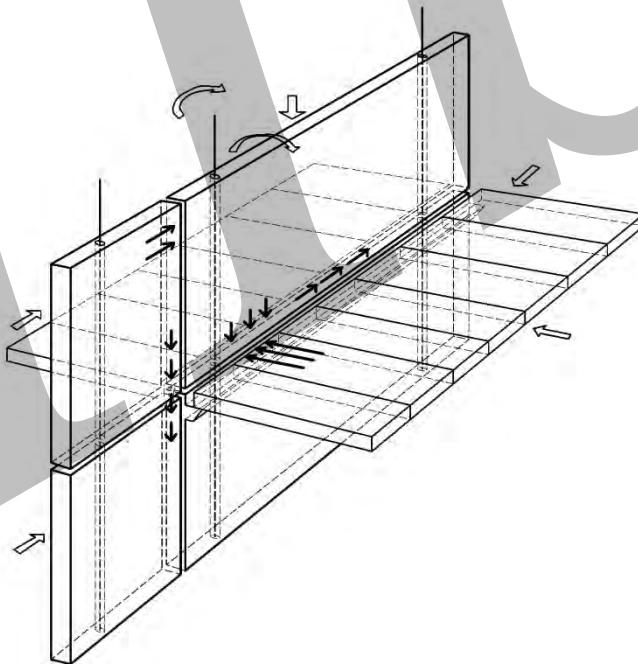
Action effects in the vertical and horizontal connections between wall panels
